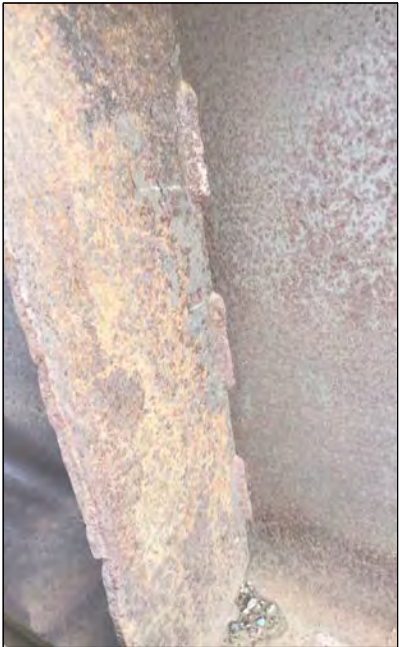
PHOTO OF EXISTING INTERMEDIATE STIFFENER WELD
